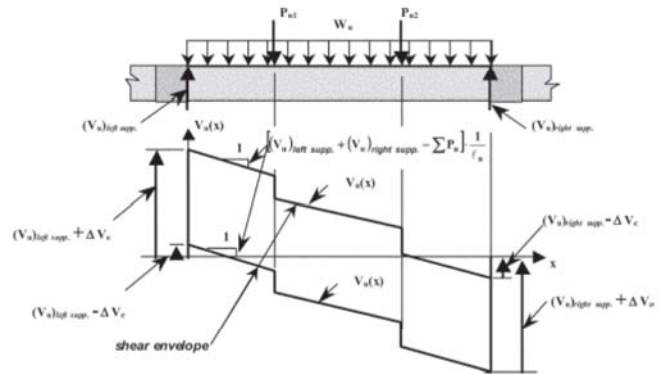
Calculation of the shear envelope in the girder.
